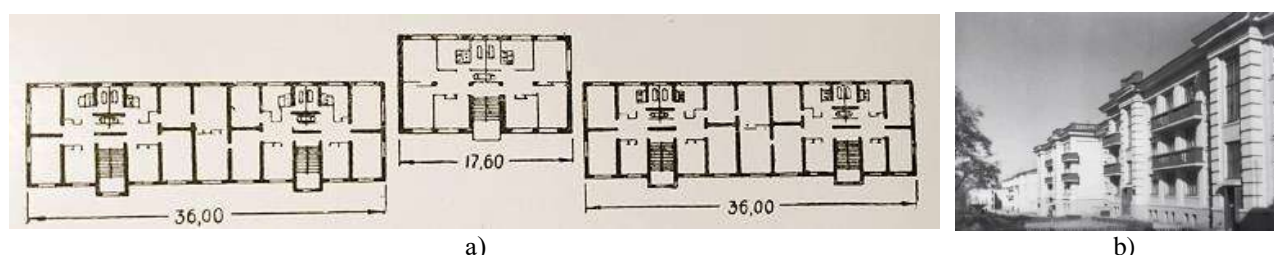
dwelling complexes (Zhilkombinat) no 2 (architect Borisenko): a) second floor plan; b) fragment of the facade, photo (Medykulov, 1953)
